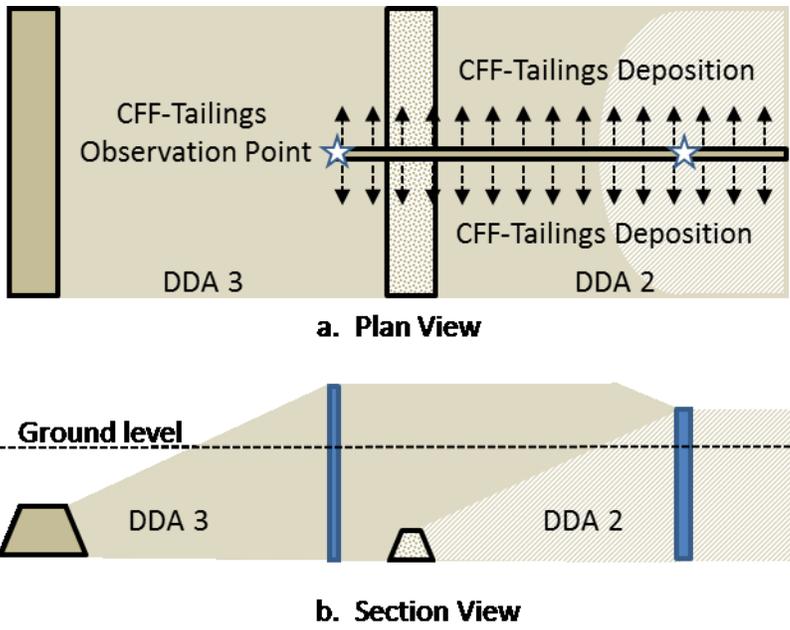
Deposition plan for CFF tailings into DDA 2 and 3.
